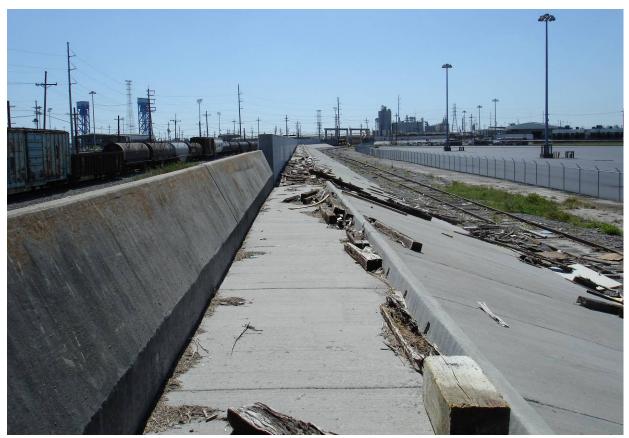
I-wall and splash apron, IHNC west along France Road; new T-wall and splash apron in background (L.Wooten)
